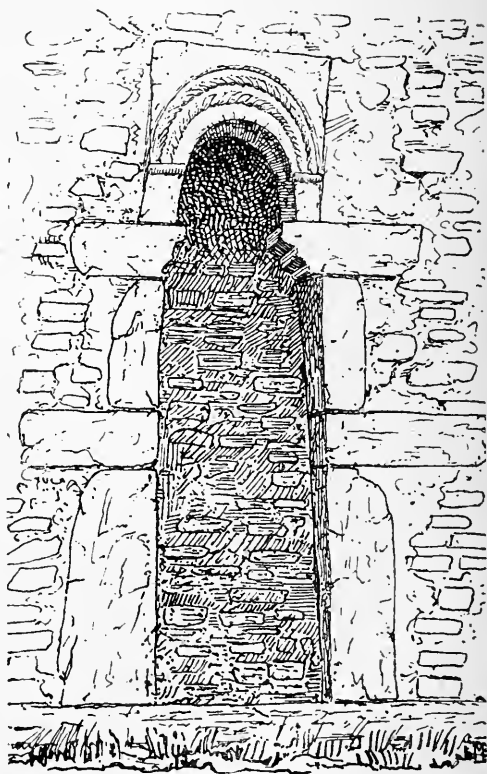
Doorway in north wall of nave, Somerford Keynes, Wilts.
